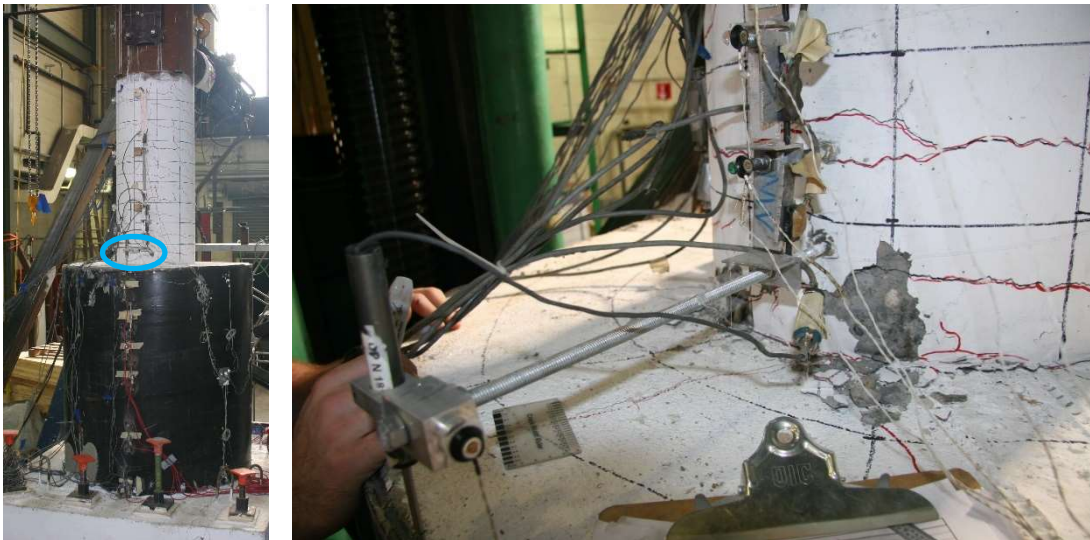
Specimen 48-21 Spalled Region at Base of North Face of Column at 2.6% Drift
